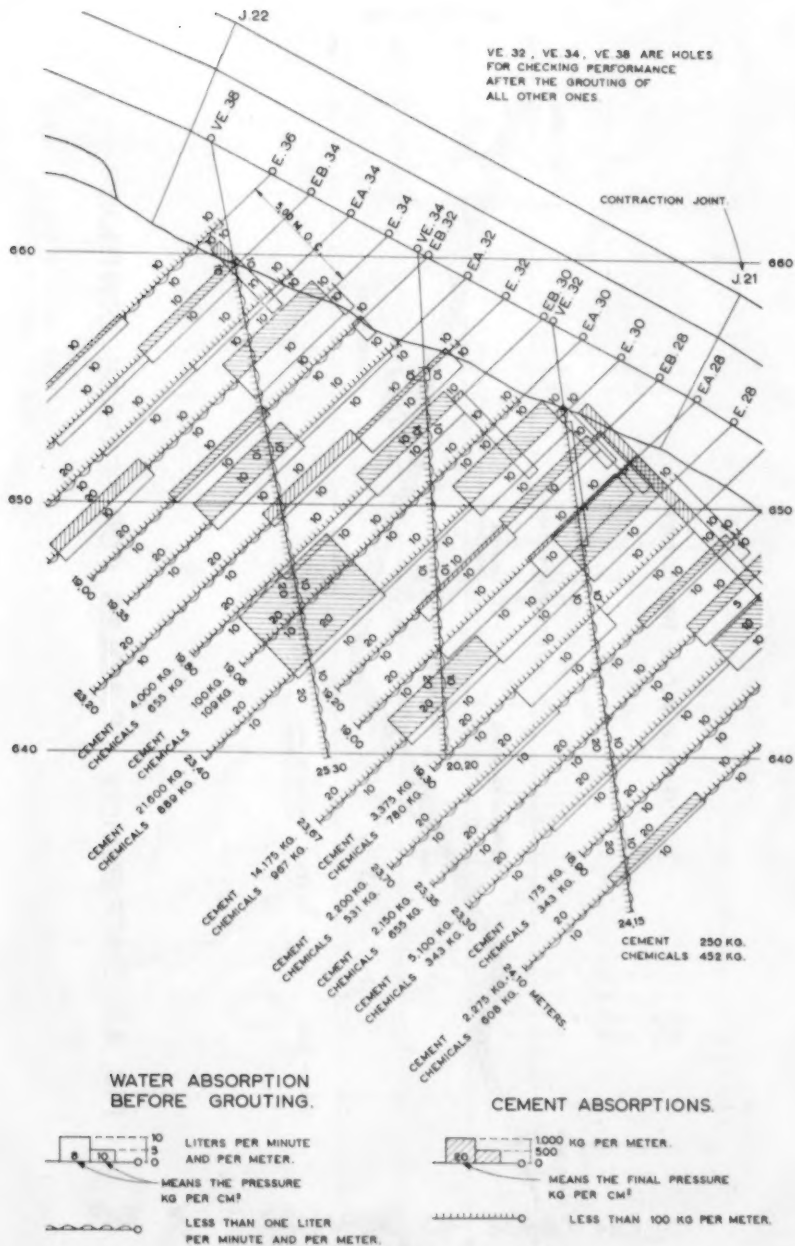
FRAGMENT OF MAIN GROUT CURTAIN.
